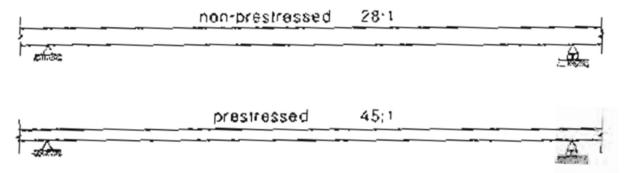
Typical One-Way Span to depth ratios of beams [15]
